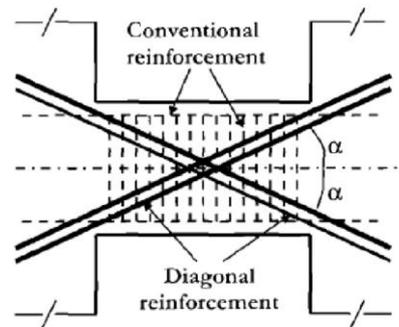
Diagonal reinforcement in RC coupling beams.
